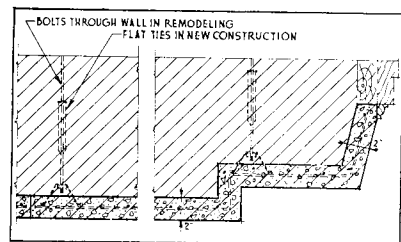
Details for erection of large, thin precast slabs in new and old construction.
